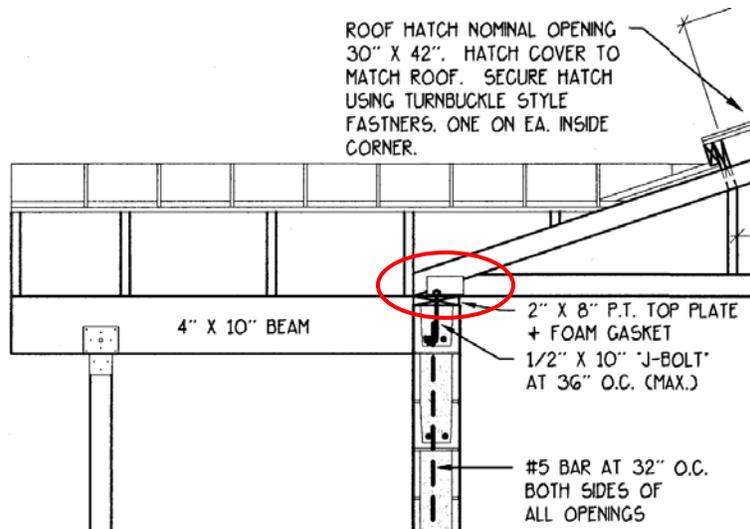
Inadequate Wall Out-of-Plane Anchorage Connection
